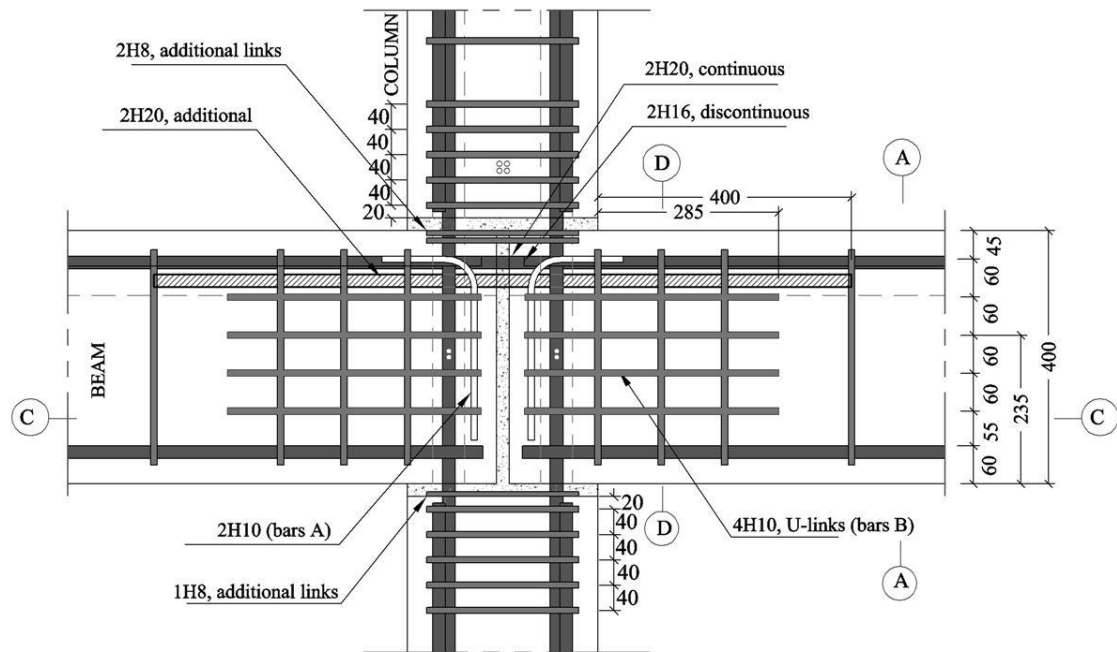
Details of specimens GR1 and SW1 (connection reinforcement type T1)
